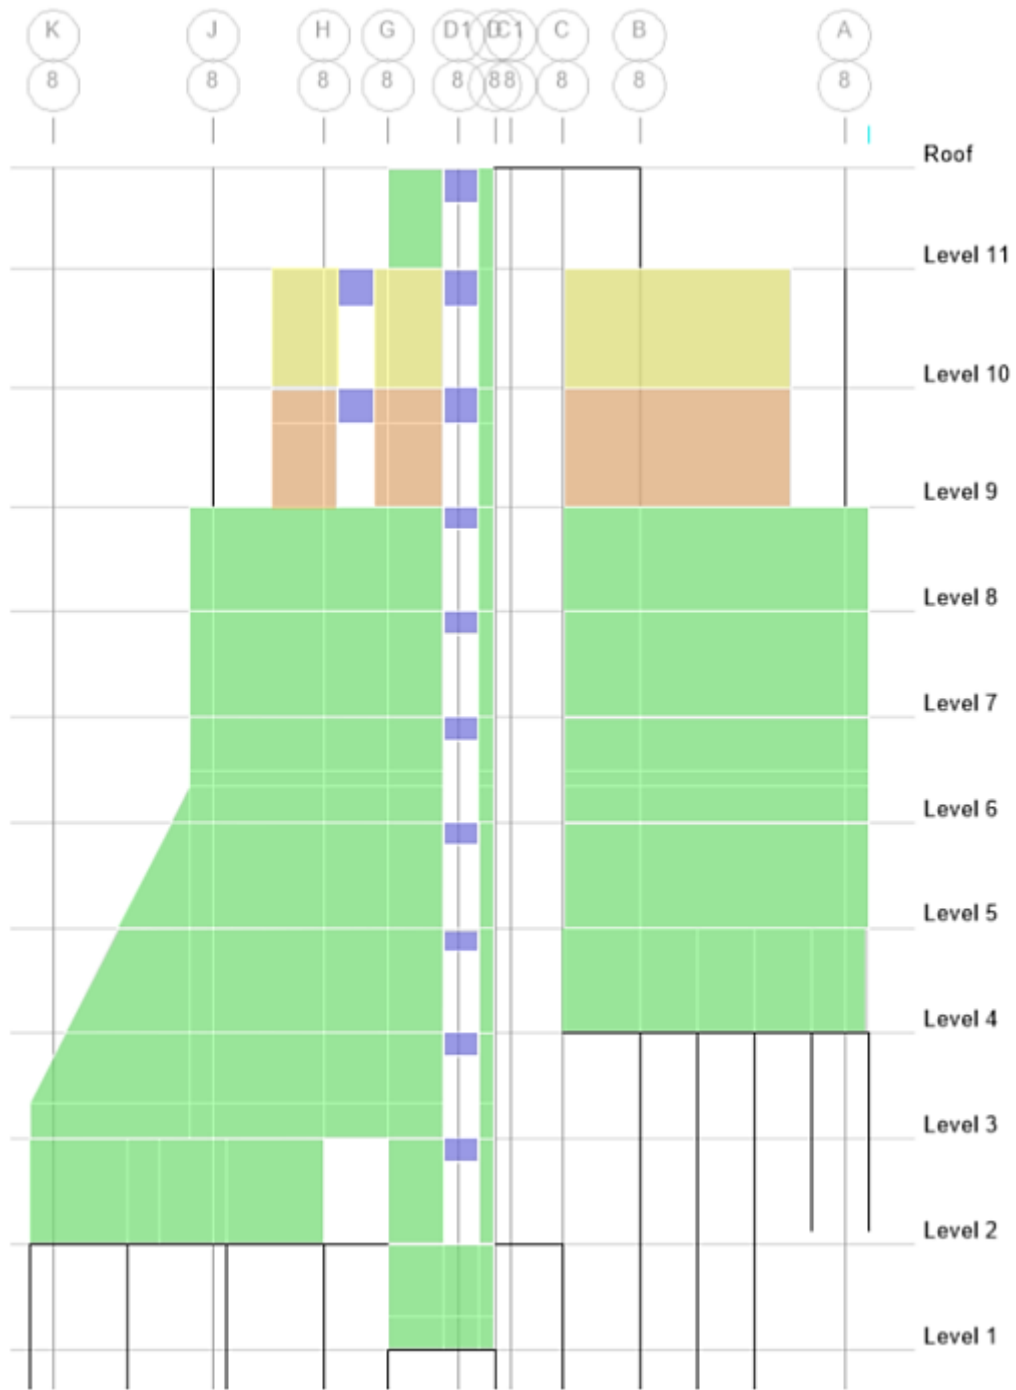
, Gridline 8 Transverse Direction Wall – North Structure
